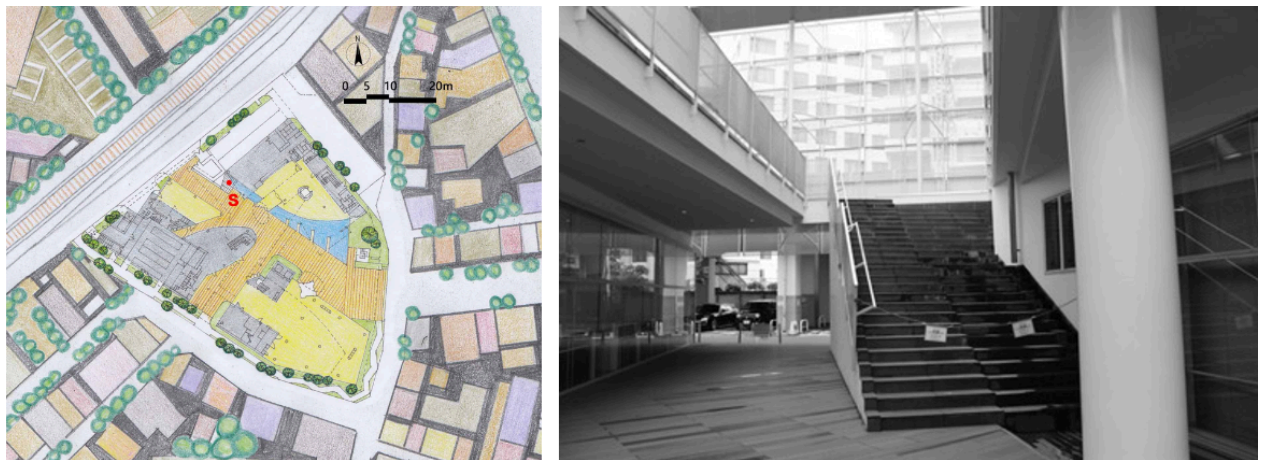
The staircase (S) between the north and west building. (Source from: drawing and photo from the author)
